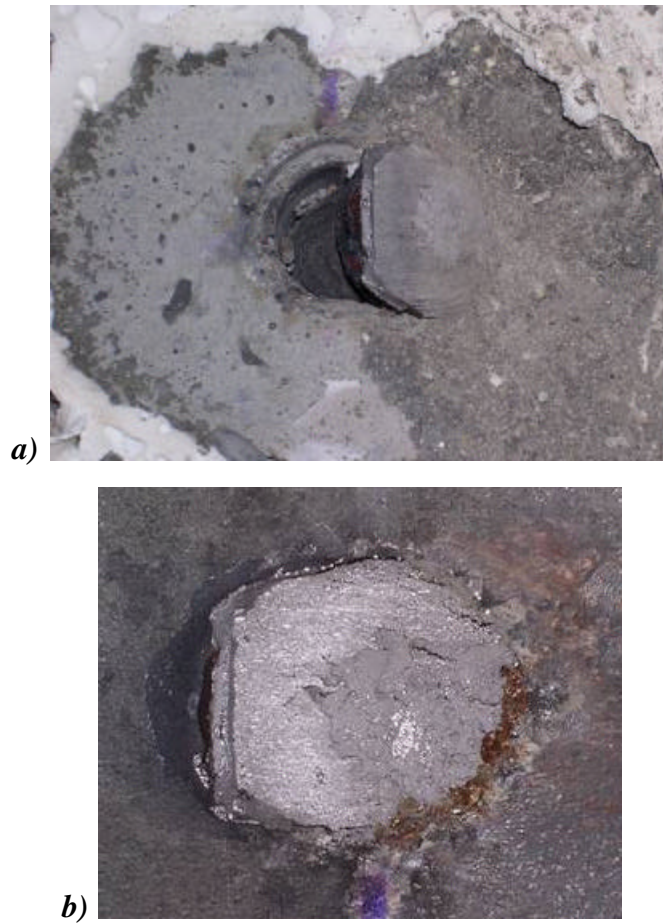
Failed Specimen POSST20: a) concrete block, b) steel plate
